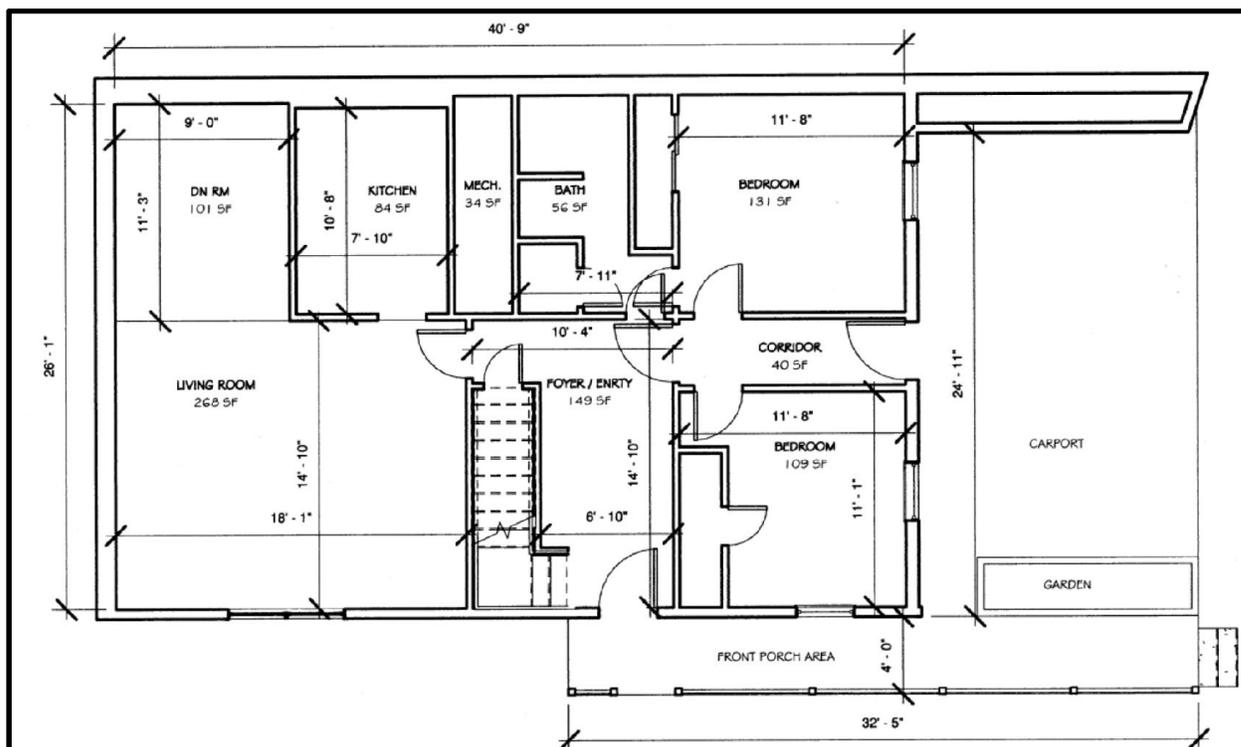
Accessory Dwelling Unit layout, lower level. Source: Applicant.
